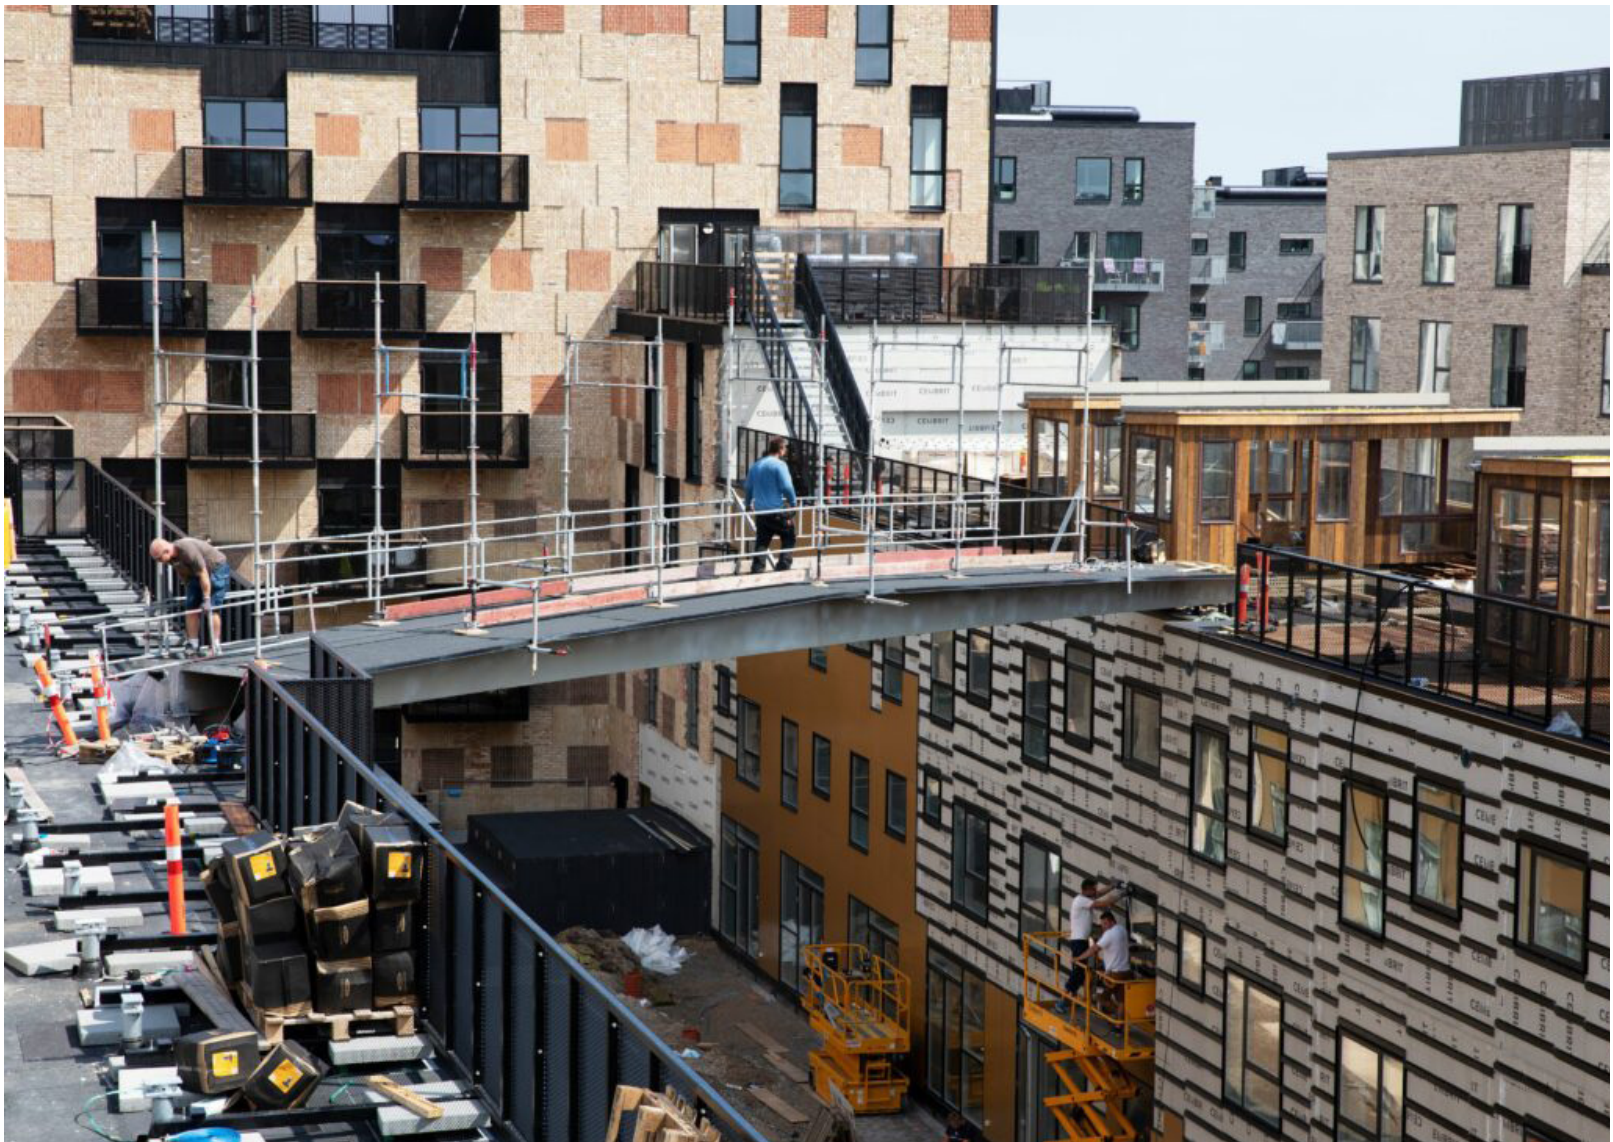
Construction of the residential complex, bridge made by a recycled beam
